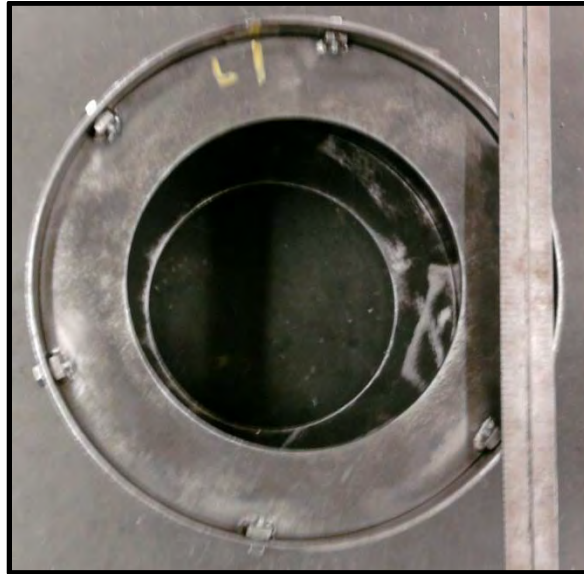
Picture of damaged thin walled cylinder of instrumented section after hard driving condition encountered at Fontana, CA test site.
